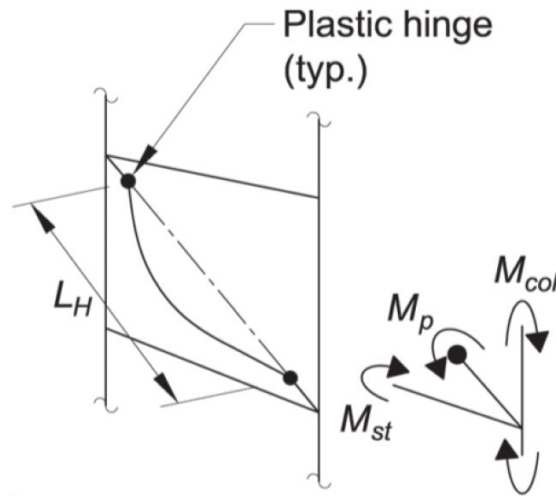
Bending moments in column and strut coming from brace buckling (American Institute of Steel Construction, 2016a)
